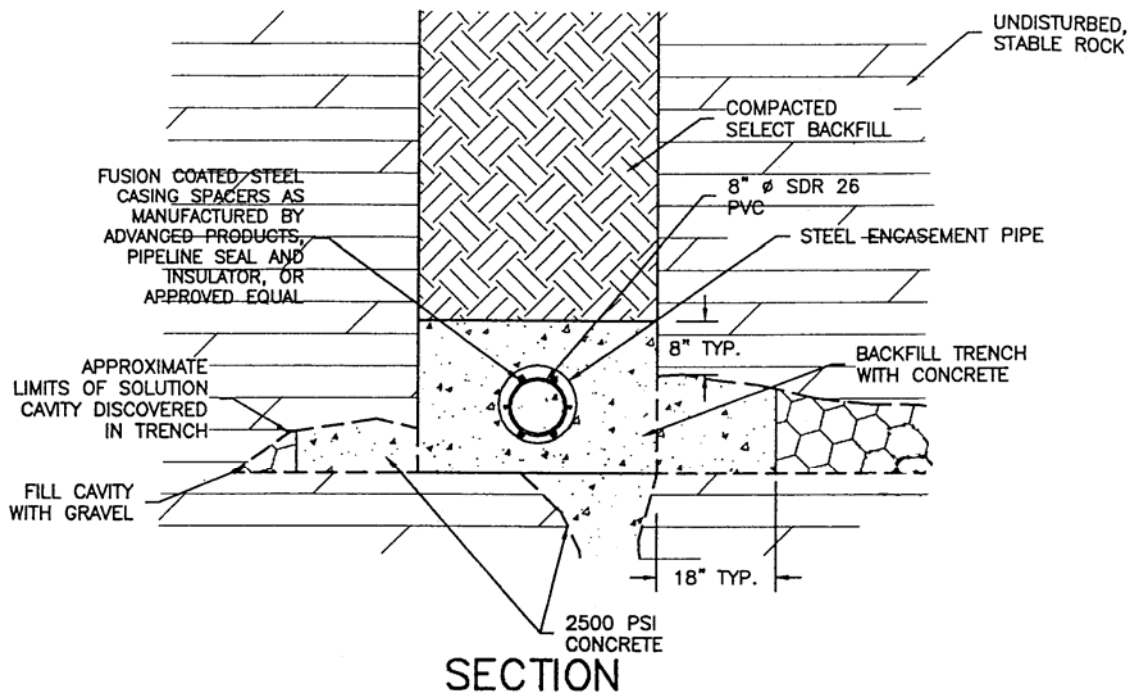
Utility Pipe Encased in External Steel Pipe (courtesy of Kathryn Woodlee)
